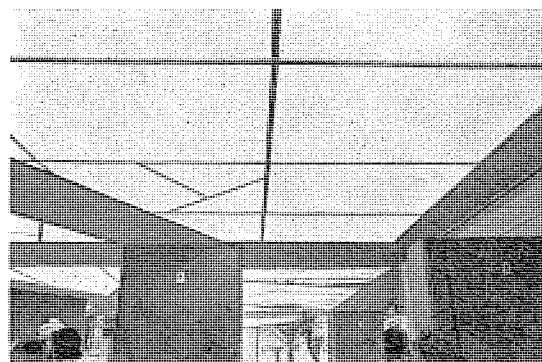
Arrangement of 3rd~6th floor lighting fixtures.
